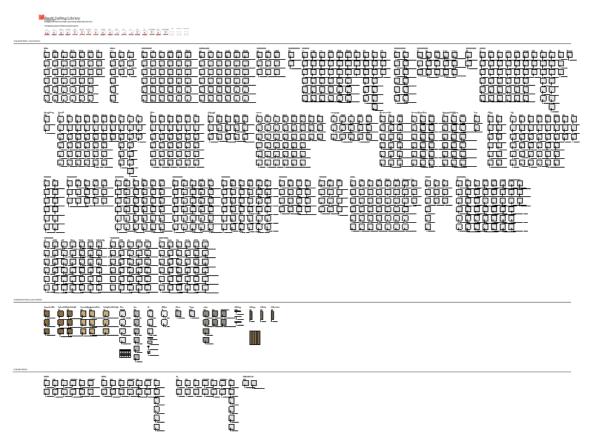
Ceiling Plan View in the file Revit Ceiling Library.rvt.
